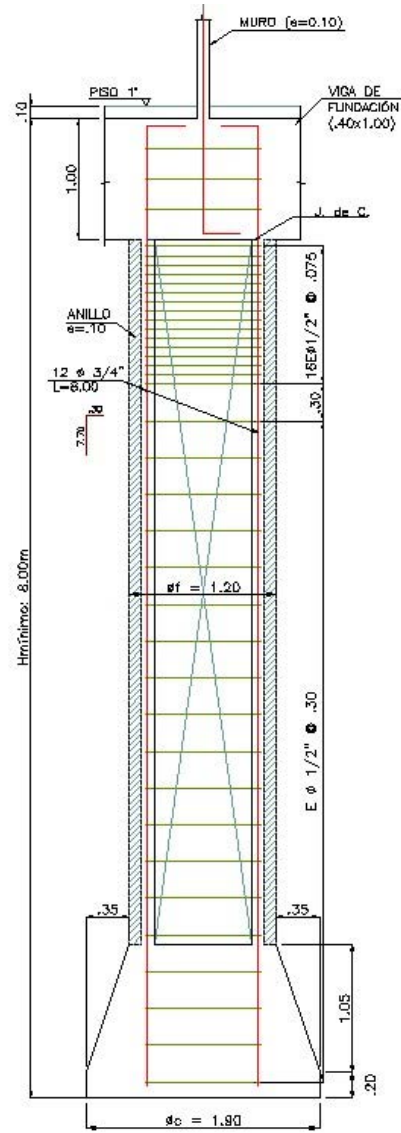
Typical hollow reinforced pile (elevation). Common foundation type. Seven story project. Photo courtesy of Alvaro P
